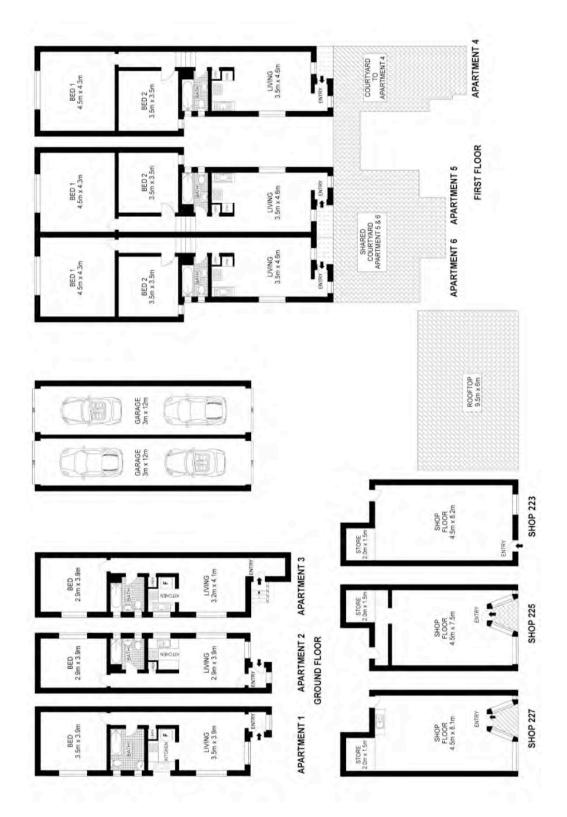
223-227 Bronte Road and 94 Carrington Road, Waverley
